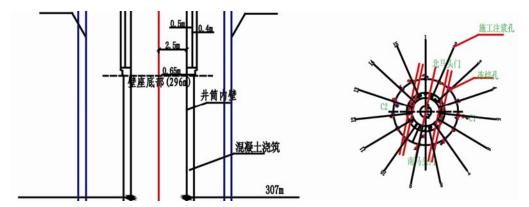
Layout diagram of grouting holes in the upper section (307m) of ingate
